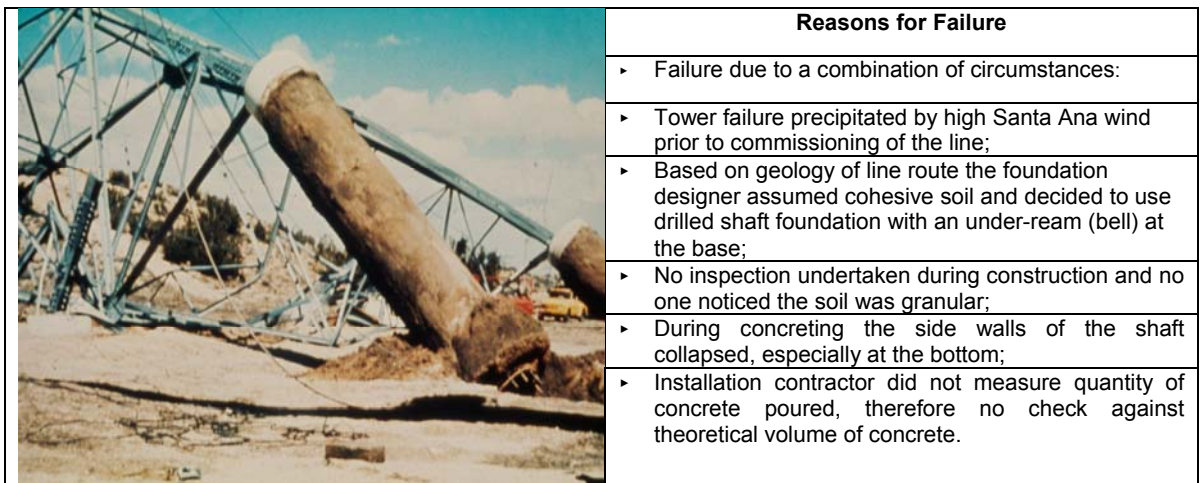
Failure of a 500 kV Suspension Tower Drilled Shaft Foundation
